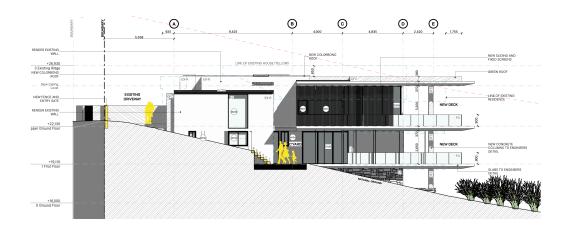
Proposed Dwelling - Western Elevations (Image Source: Fabric Architecture Studio)
